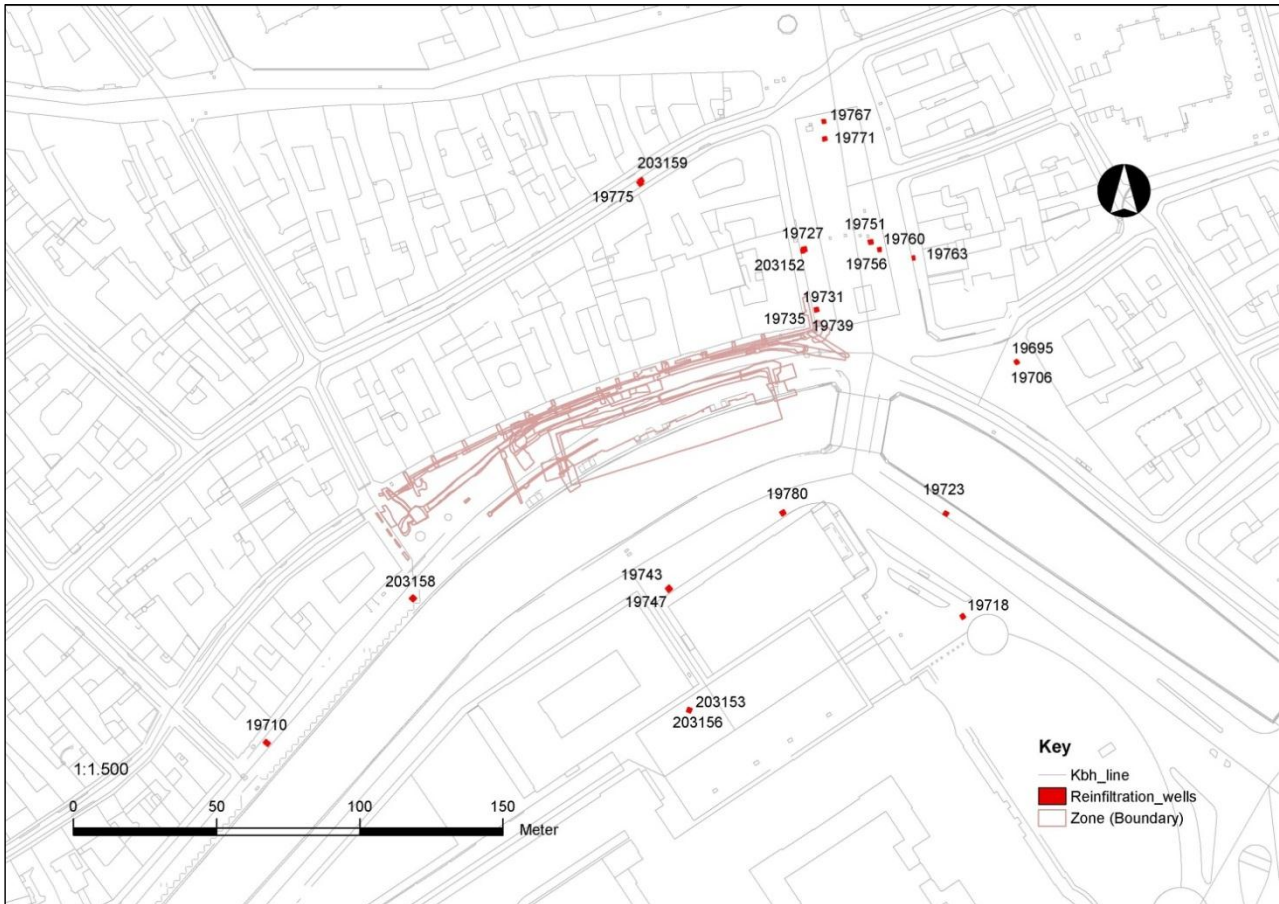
Plan showing location of Re-infiltration trenches in relation the Metro Cityring Project area
